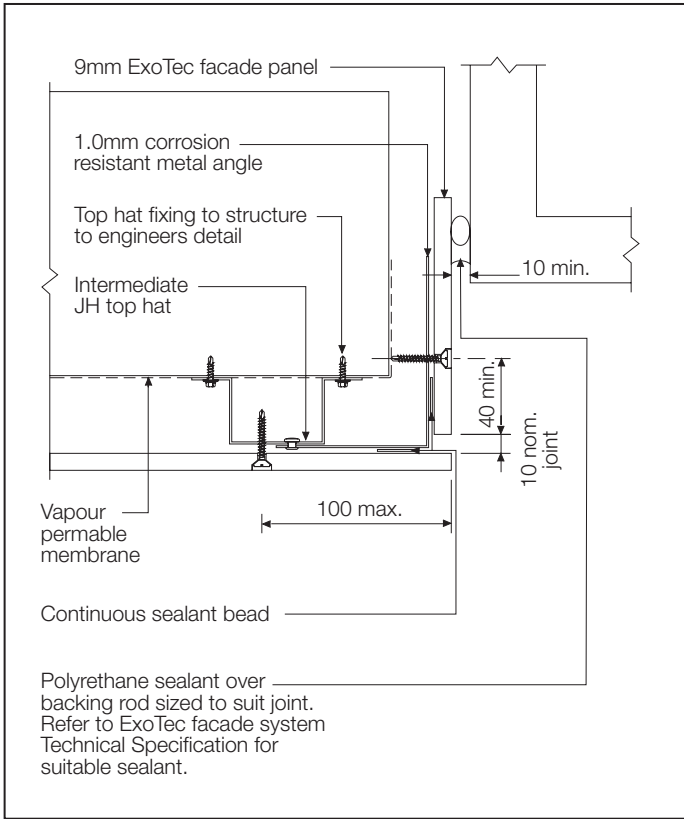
PLAN VIEW: STEP FLASHING TO MASONRY WALL
